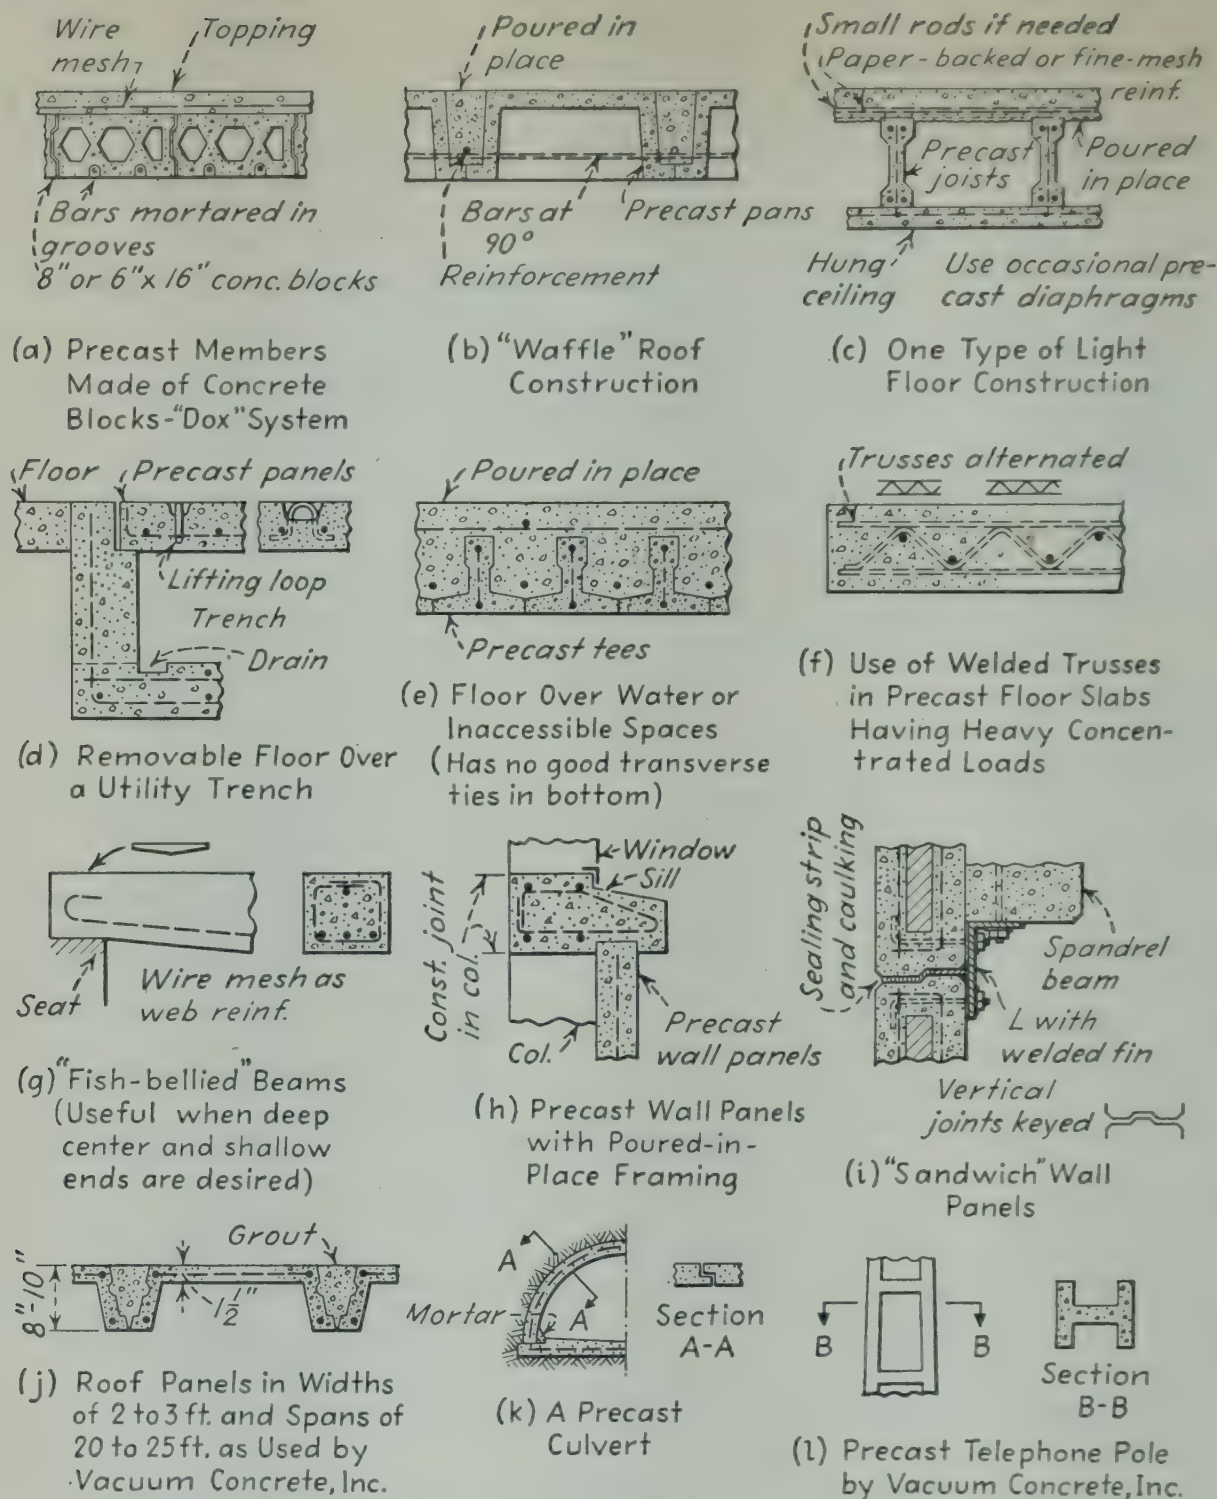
Some miscellaneous details of precast-concrete construction.
